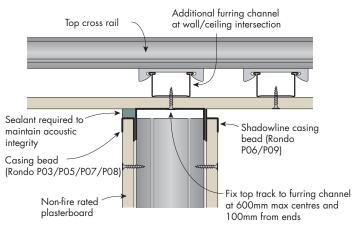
Wall Head to Suspended Ceiling Finishing Detail
